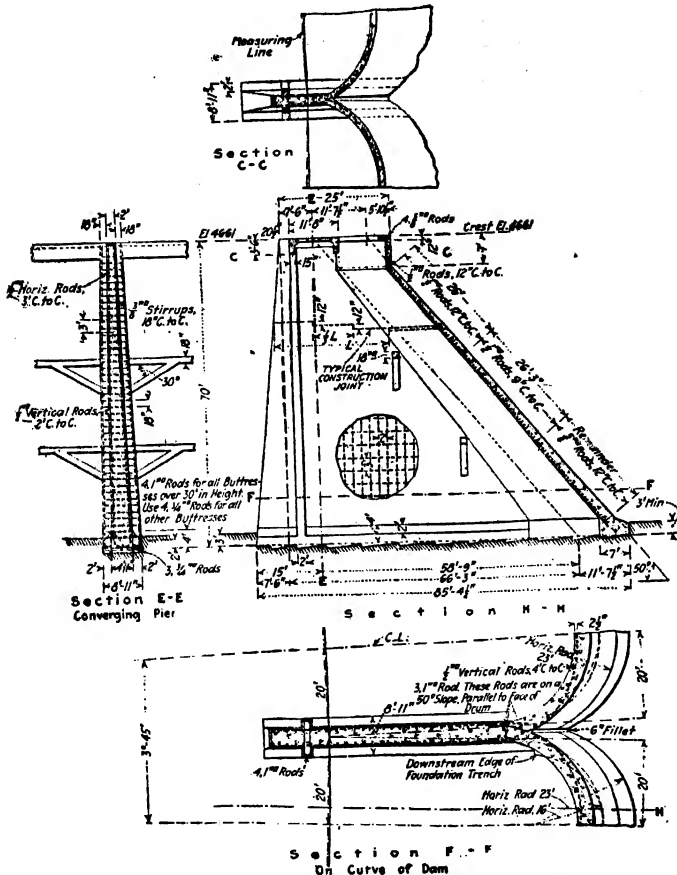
Details of Lake Eleanor multiple arch dam.
